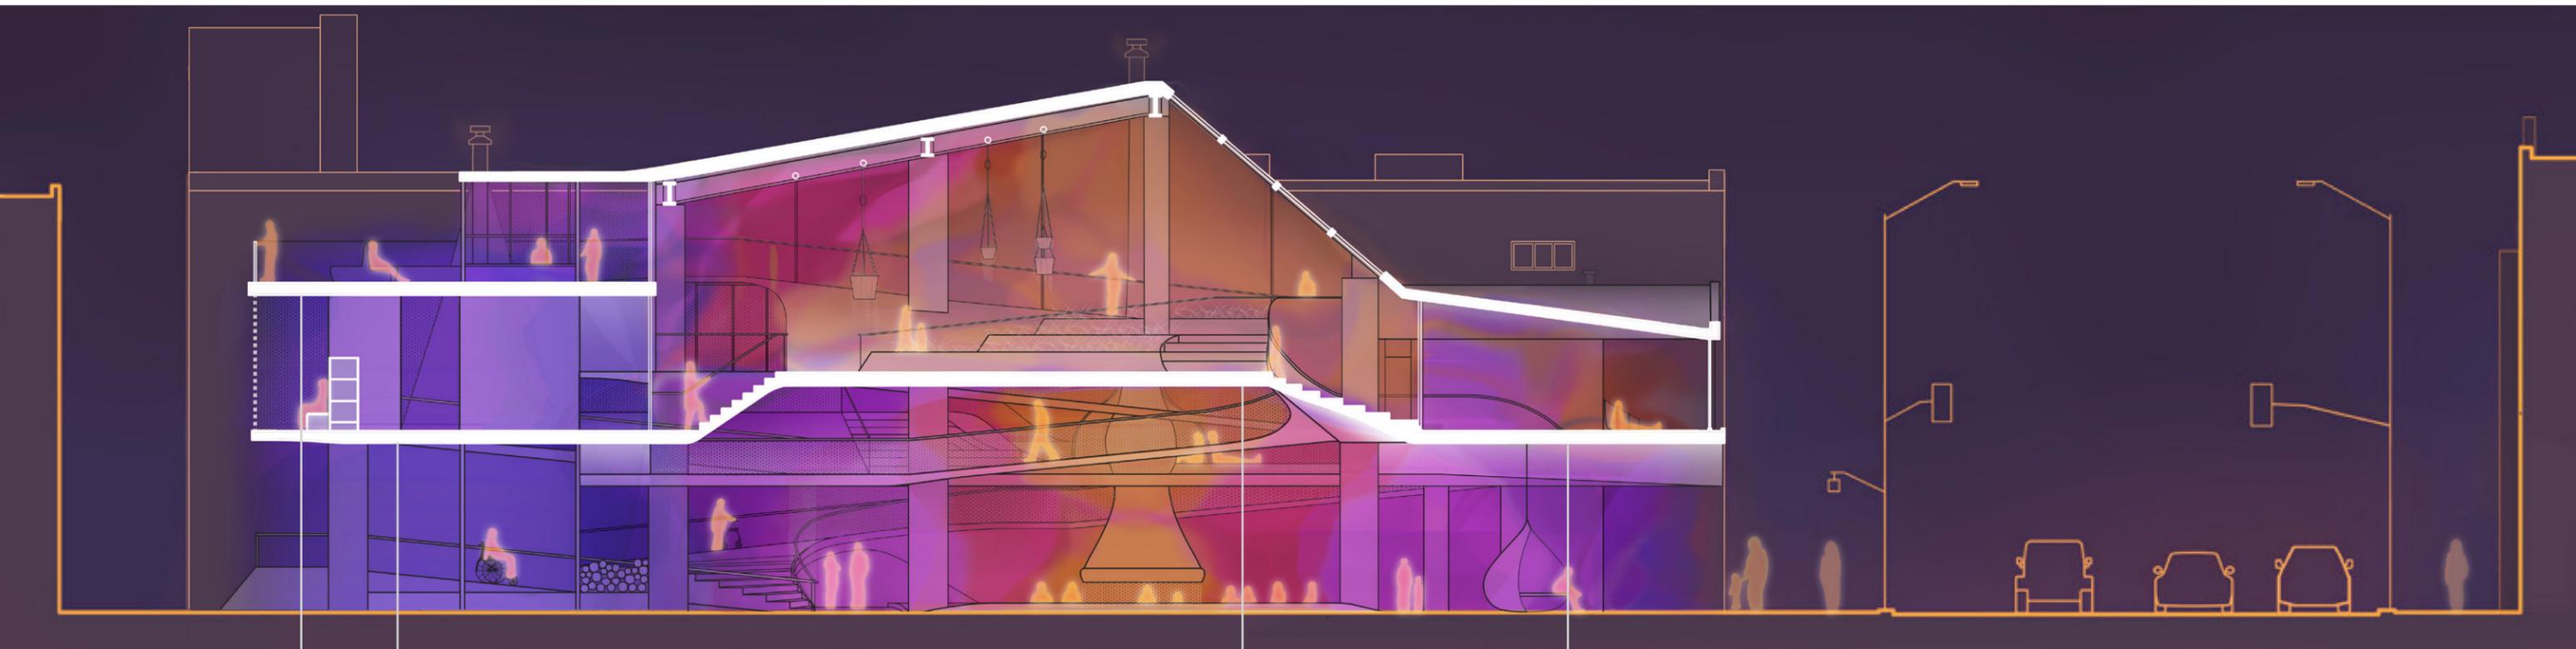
Thermal Longitudinal Section 2: West Face.
